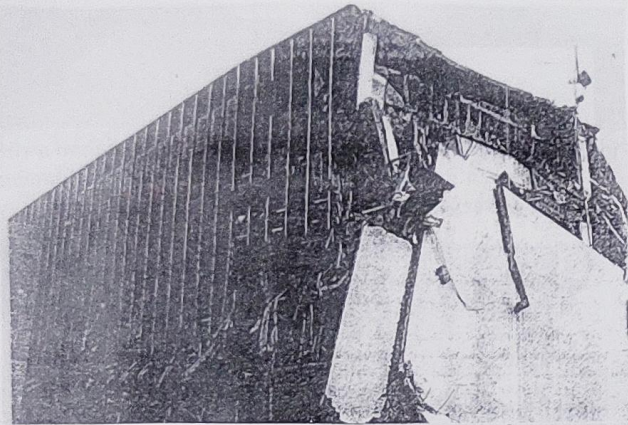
Discontinuous shear wall failure, office building, Northridge
